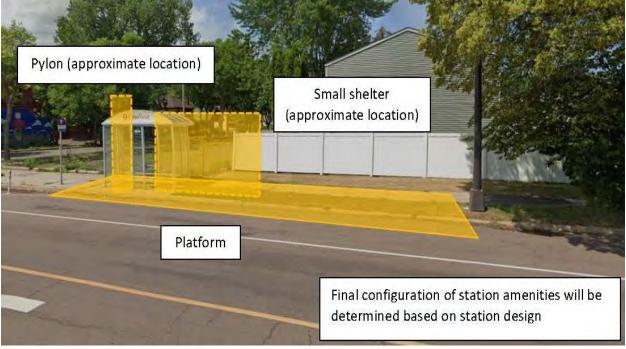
Robert Street South and Isabel Street East proposed southbound platform in area of the Isabel.
